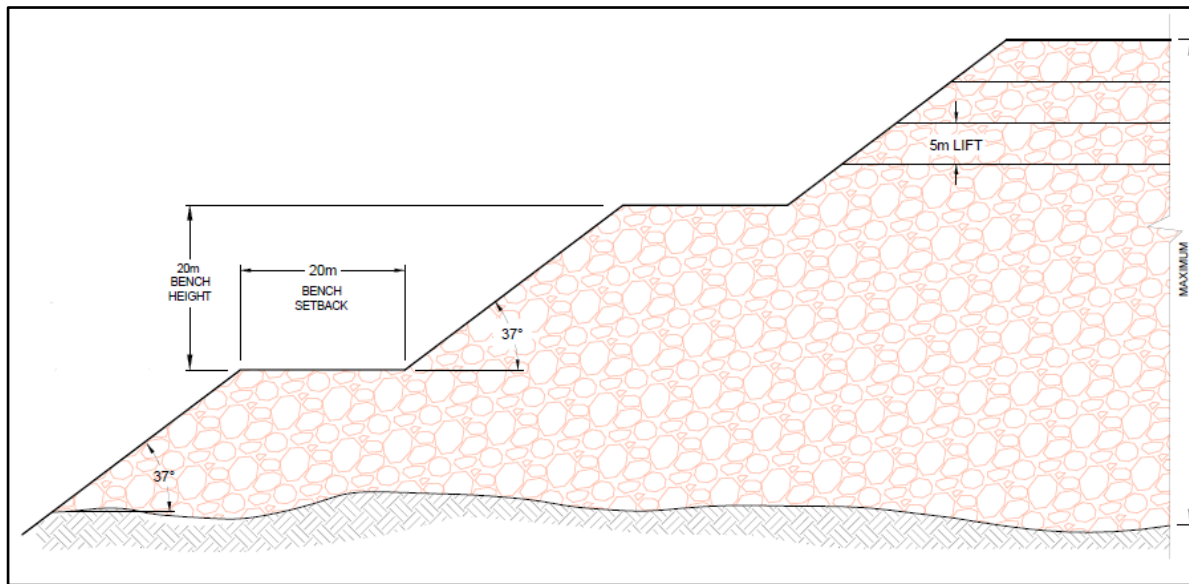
Typical Cross Section of the Whale Tail Waste Rock Storage Facility
